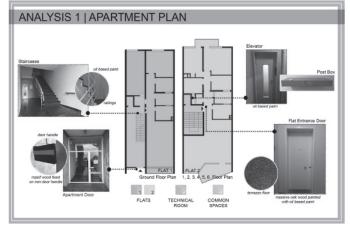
Analysis of Gökçeoğlu Apartment Building; plan layout and materials (© Author's archive).
